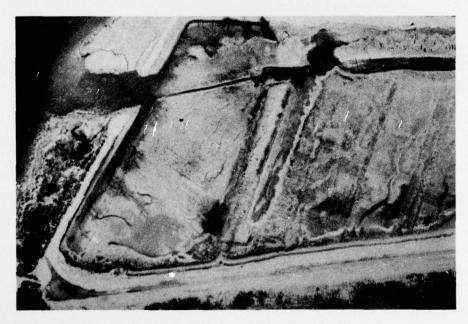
Aerial view of Salt Pond No. 3 after construction of the dike breach and drainageways
